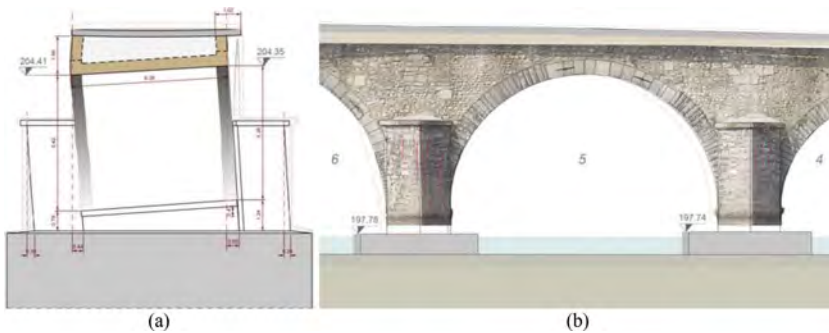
a) Out-of-plumb of the 5th bay southwards and b) photogrammetric view of two piers (south side) at the barrels of arch 5 with the crack pattern survey highlighted in red.
